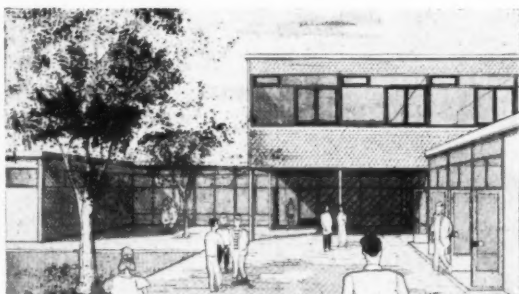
(above). Plan of Ordsall two-form entry secondary school at Retford (job architect, J. Griffin). This school is being built on a heavily wooded site in the grounds of Ordsall Hall. There is a good view to the east over the lawn and gardens of Ordsall Hall. The specialist areas radiate from the cultural and administrative centre, the 2-storey classroom block and library have been sited to take advantage of the view to the east. (Scale:  $\frac{1}{8}$ " = 1 ft. 0 in.) Fig. 5 (left). Perspective drawing of part of the entrance courtyard at Ordsall Secondary Modern School, showing the 2-storey classroom block faced with "club foot" clay tiles and wooden windows. In contrast, the end of the single-storey block on the left is faced with concrete slabs.
